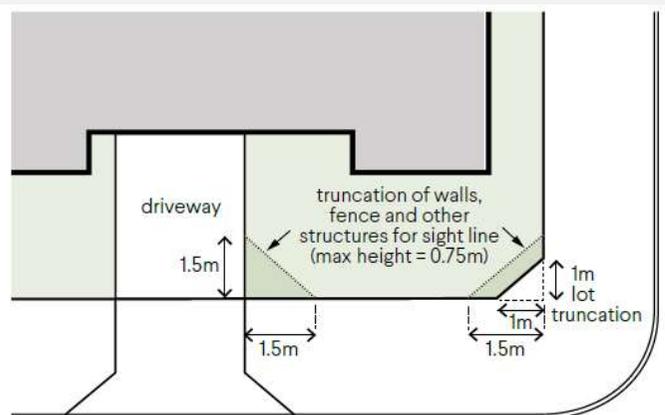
Truncation at street corner to provide sightlines (refer A3.8.7).
